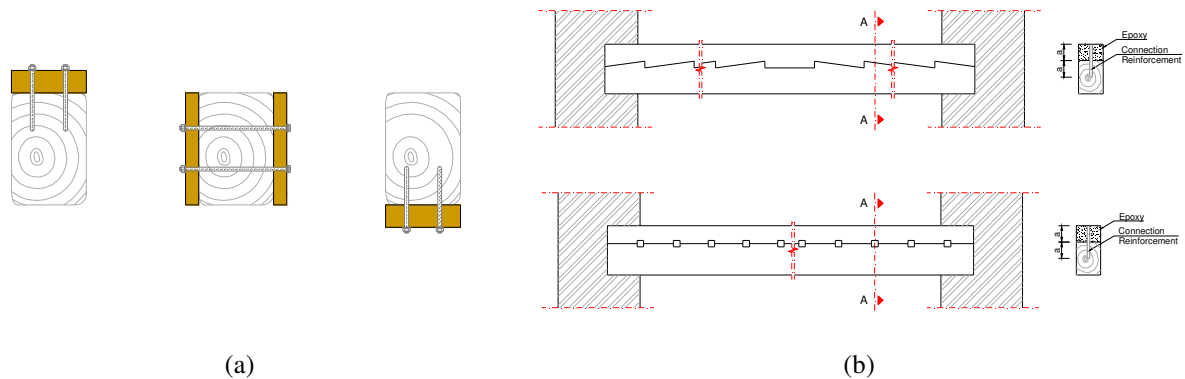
Increasing of bending stiffness of beams by connecting new timber elements. (a) Steel connections, (b) traditional timber connections, might be enhanced by straps or bored connectors.
